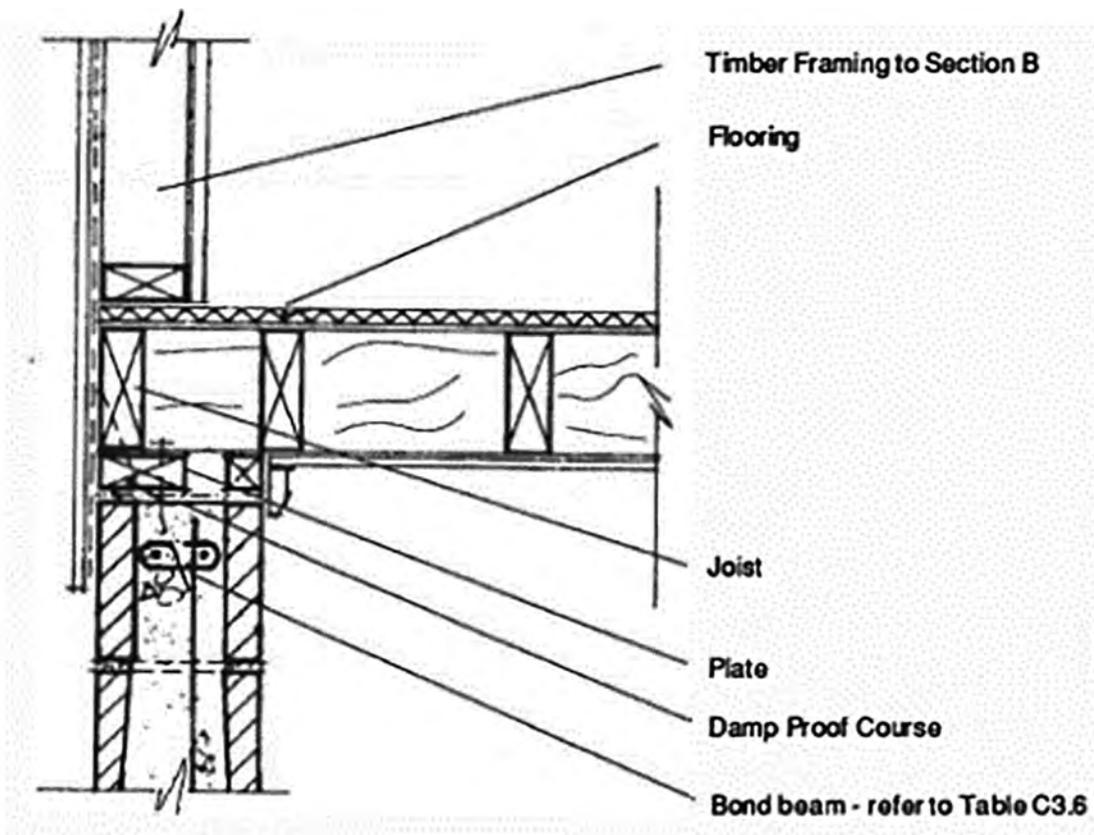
TIMBER FRAMED WALL ABOVE A CONCRETE MASONRY WALL
